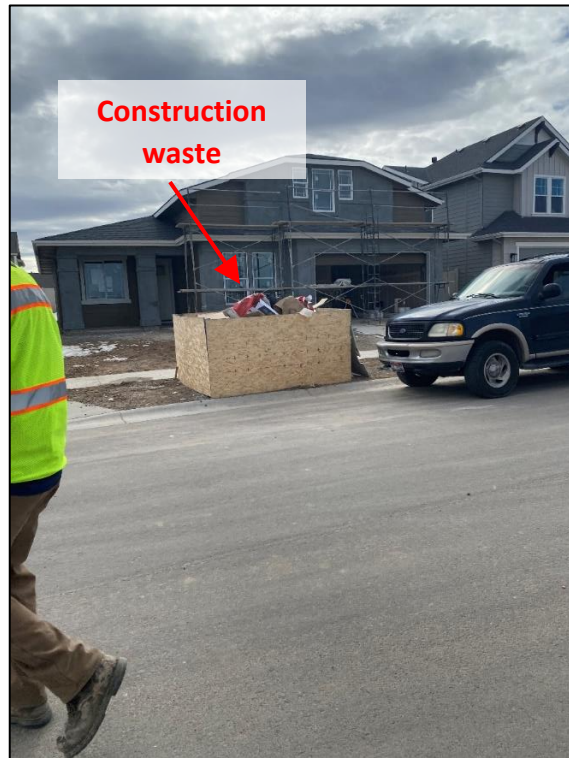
View, facing west, of uncontained construction waste and an uncovered plywood container containing construction waste outside of house lot 2202 on North Windmill Way. Note the track-out onto North Windmill Way.
